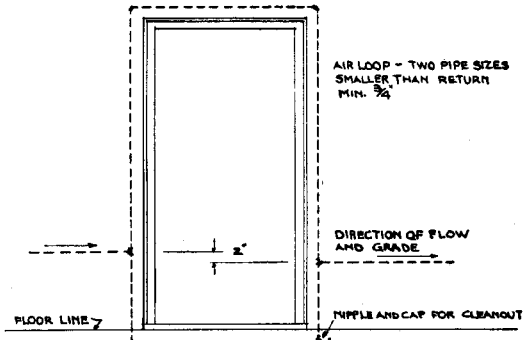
Method of crossing doorways with return piping. Low return pipe across doorway may be above floor protected by a "saddle" over it or may be installed in trench. Pipe should be protected against freezing when crossing outside doorways.
